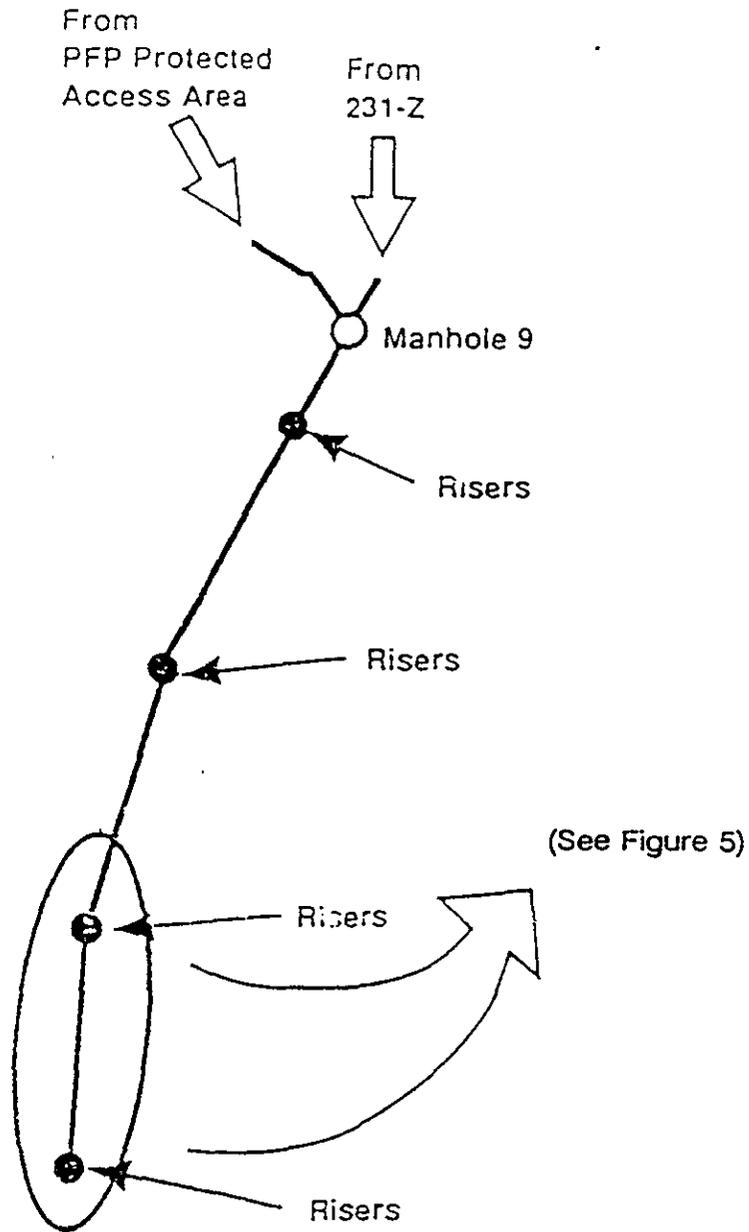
Plan and Overall Piping Schematic for Plutonium Finishing Plant Complex Effluent.
